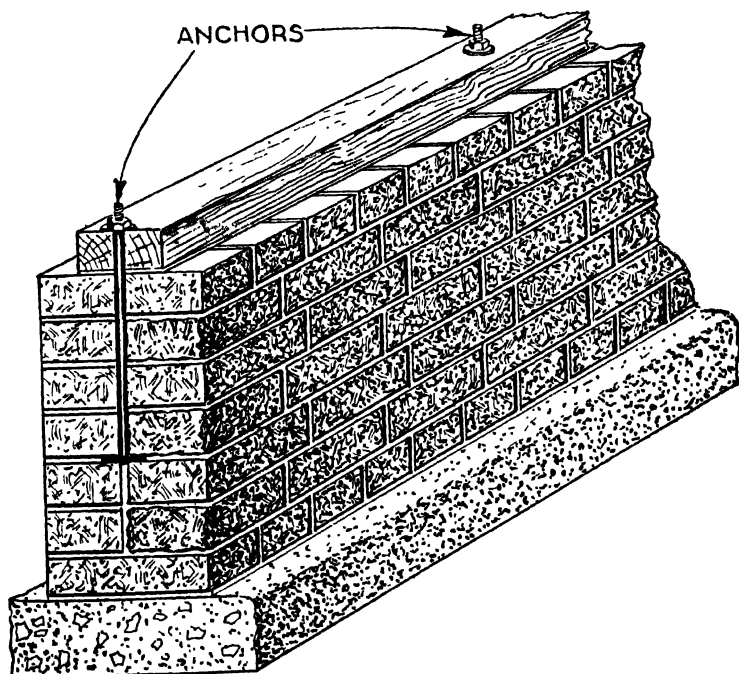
,359.—Plate anchors built into brick foundation walls for anchoring sills of framed building.
